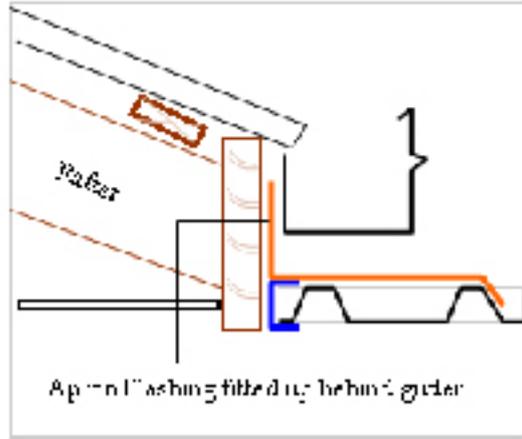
Apron flashing over skillion patio roof extension to existing roof
